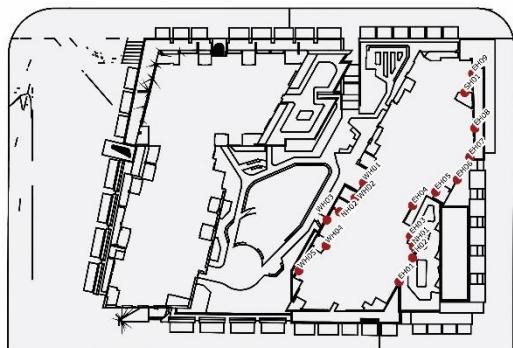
Layout of Pressure Sensors – Level 5 Plan
